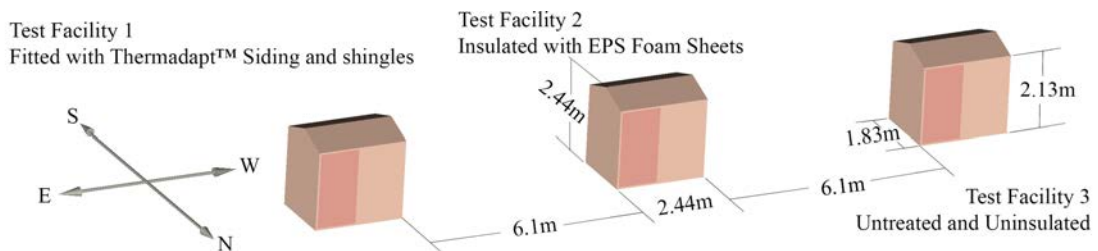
Layout of the Full-Scale Thermadapt™ Outdoor Test Range with Test Facility Geometries
